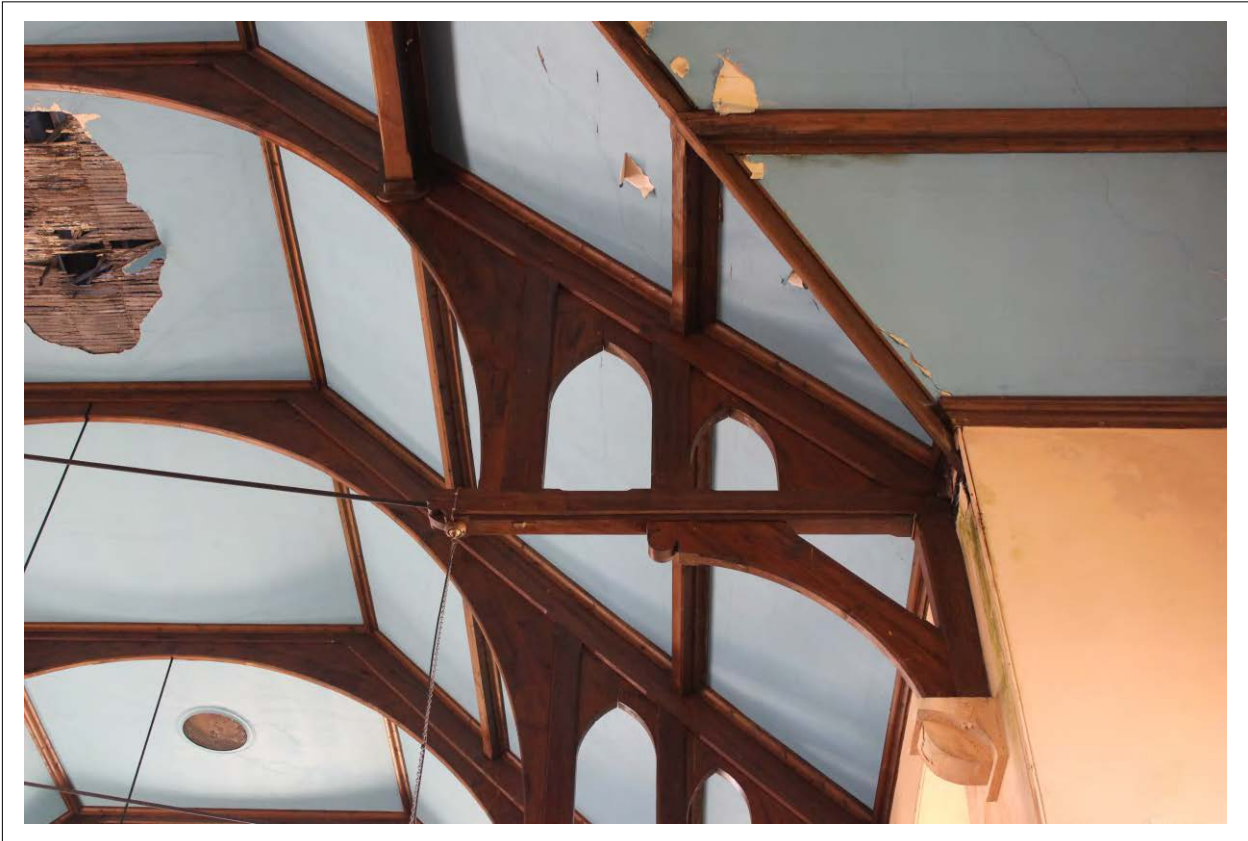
View west showing closeup of hammer beam roof truss and corbel
